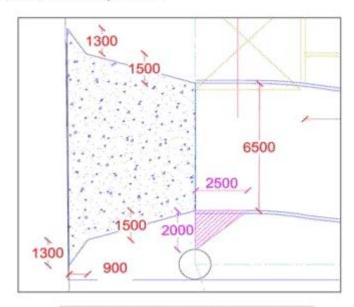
PROPOSED ACCESS ARRANGEMENTS
